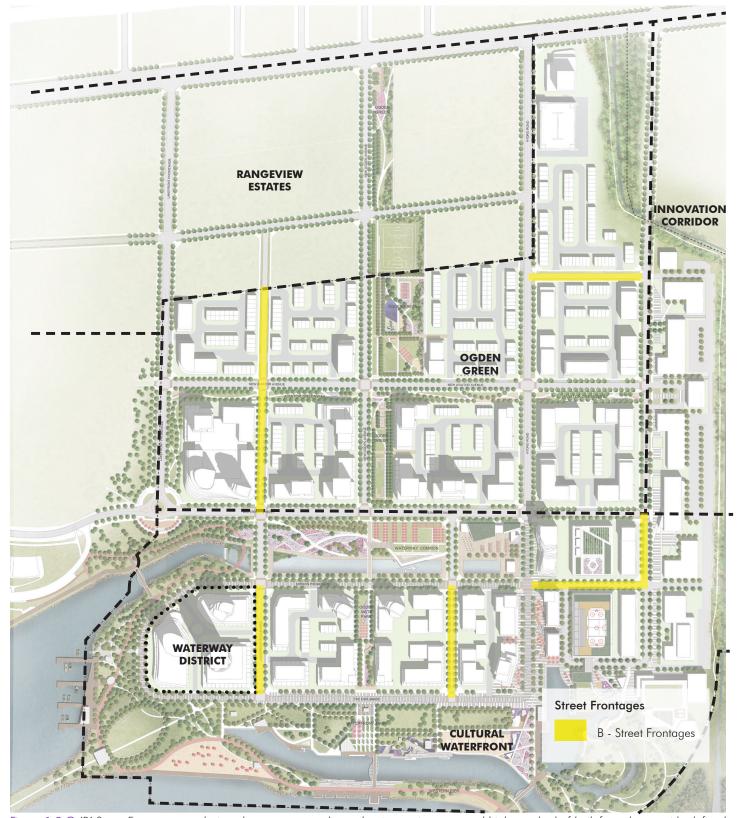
G 'B' Street Frontages are designed to ensure a quality pedestrian environment and high standard of built form, but provide defined locations for necessary access, delivery, service, loading and parking facilities serving development blocks.
